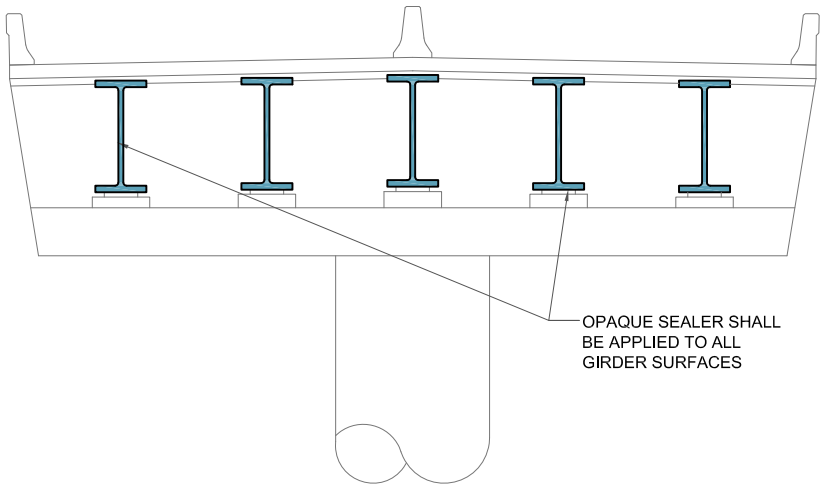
Required surfaces for aesthetic treatment on steel girders
